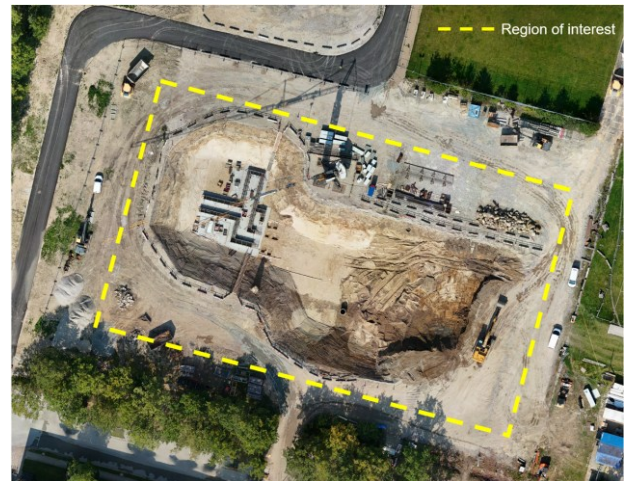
A closer look at the work site layout on 29-08-2024. The yellow highlighted boundary shows the area of interest for monitoring the construction site layout in this work.
